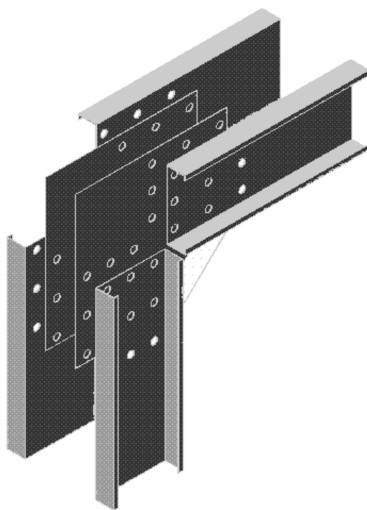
General arrangement of eaves joint of cold-formed steel portal frame having bolted moment-connections
